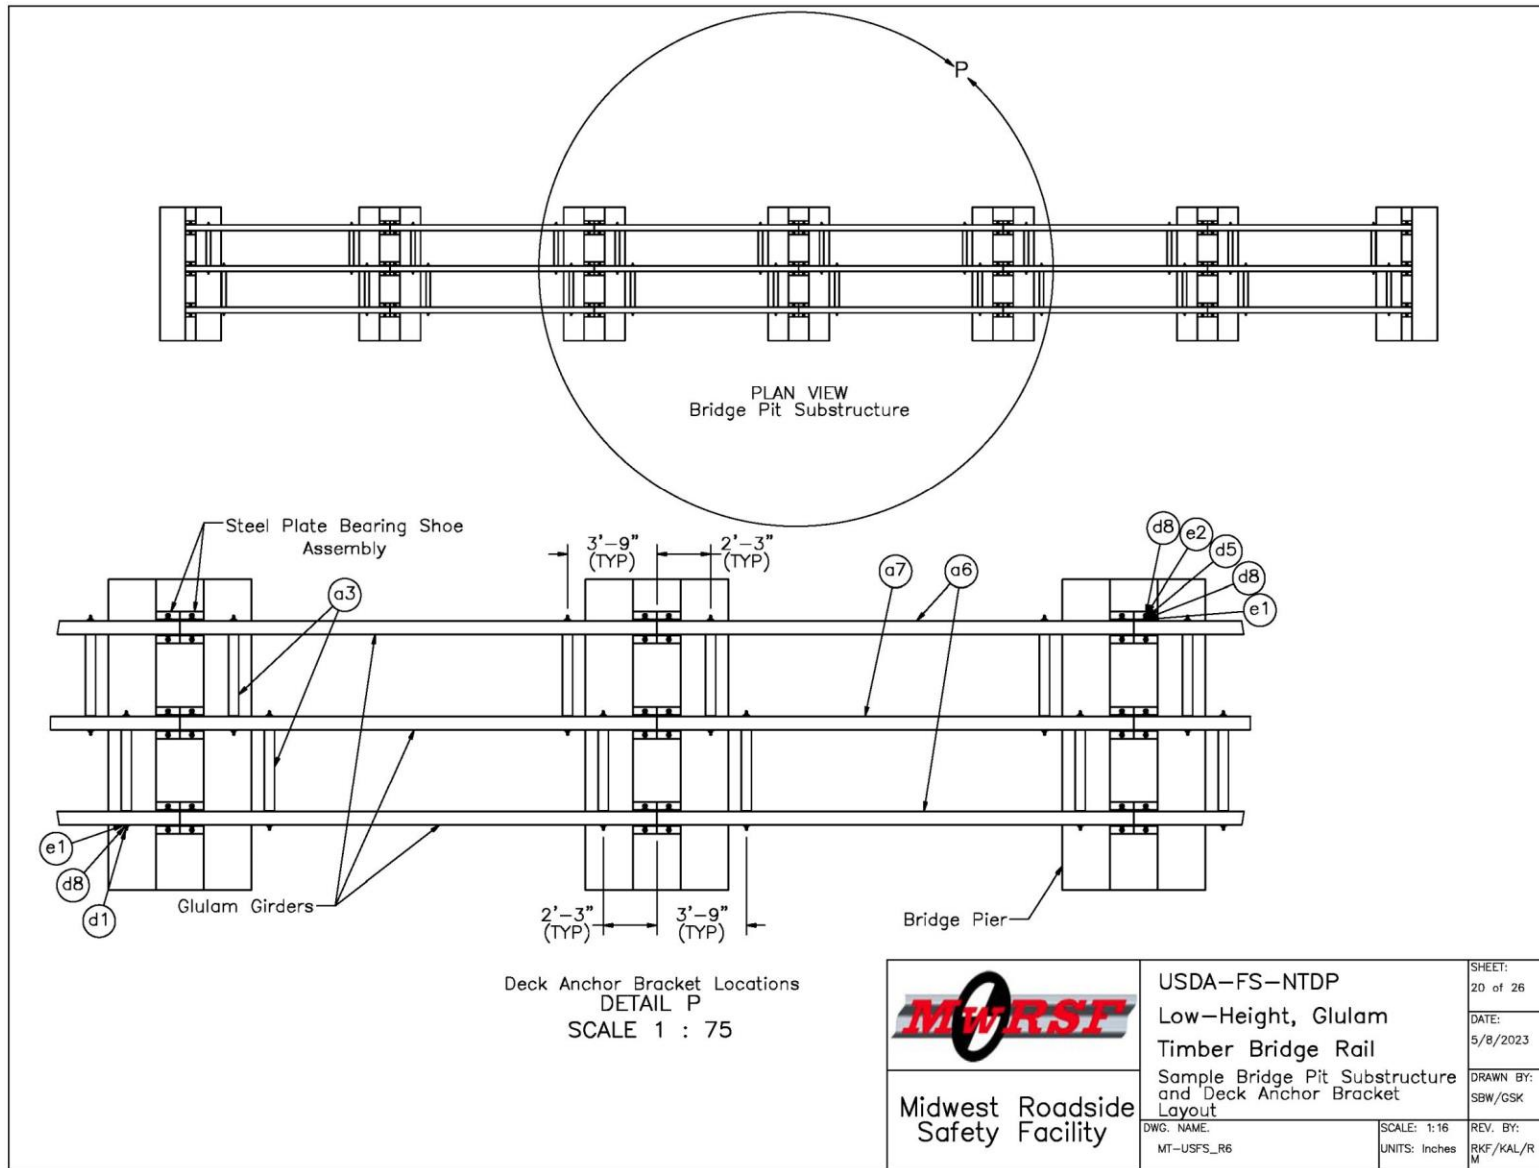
USDA-FS-NTDP Low-Height, Glulam Timber Bridge Rail: Sample Bridge Pit Substructure and Deck Anchor Bracket
